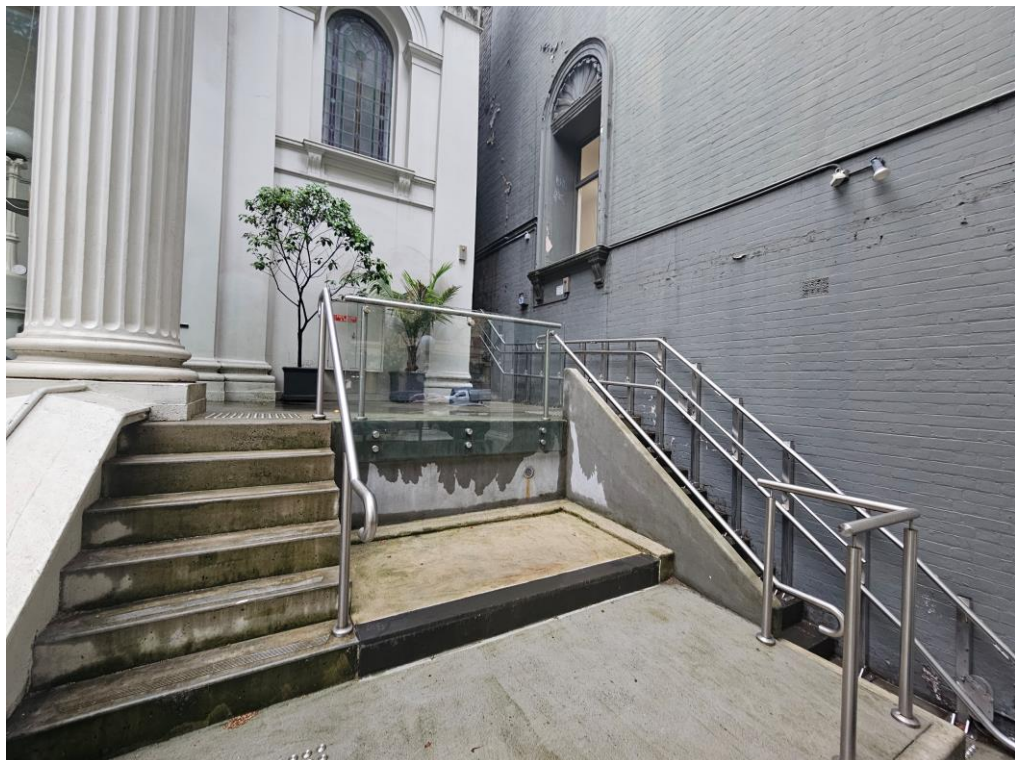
Image of the area to the southeastern corner of the Collins Street frontage, behind the low wall, facing east. The platform lift is visible to the right of the image.
